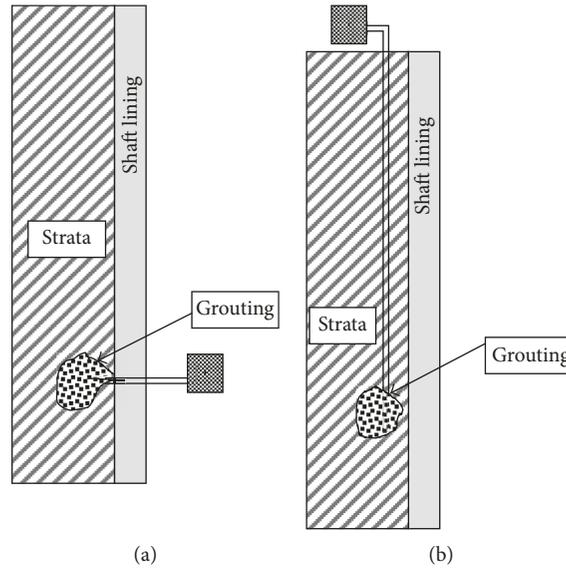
Sketch of the grouting method. (a) Grouting behind segment. (b) Grouting from surface.
